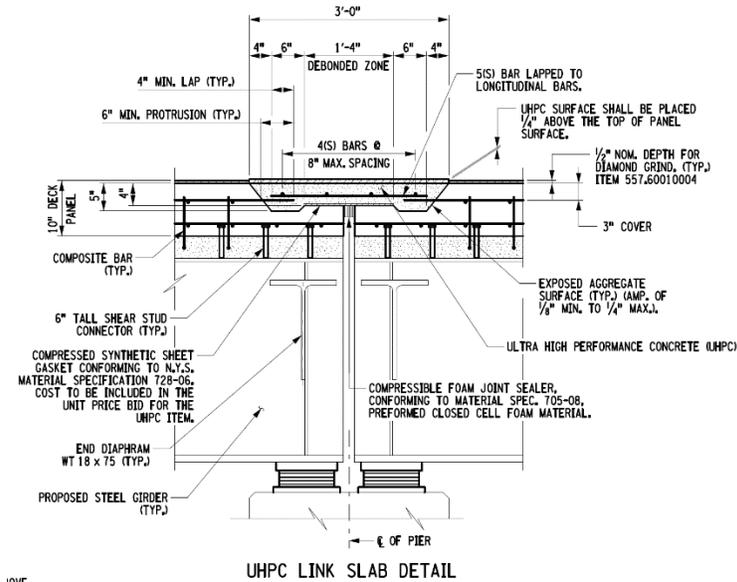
UHPC link slab detail used as basis for test specimen design (NYDOT)
